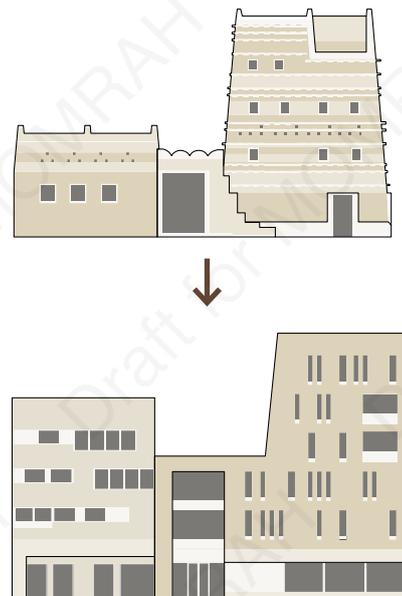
Adaptation of traditional architectural elements to a contemporary building
